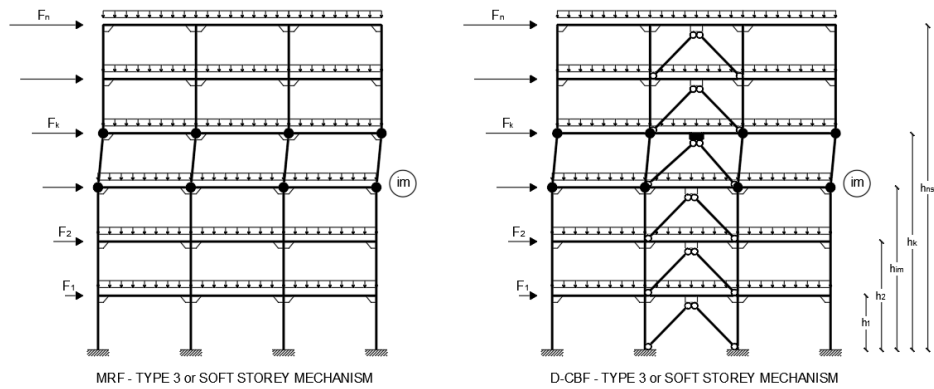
Type 3 mechanism for both MRFs and D-CBFs equipped with FREEDAM connections
